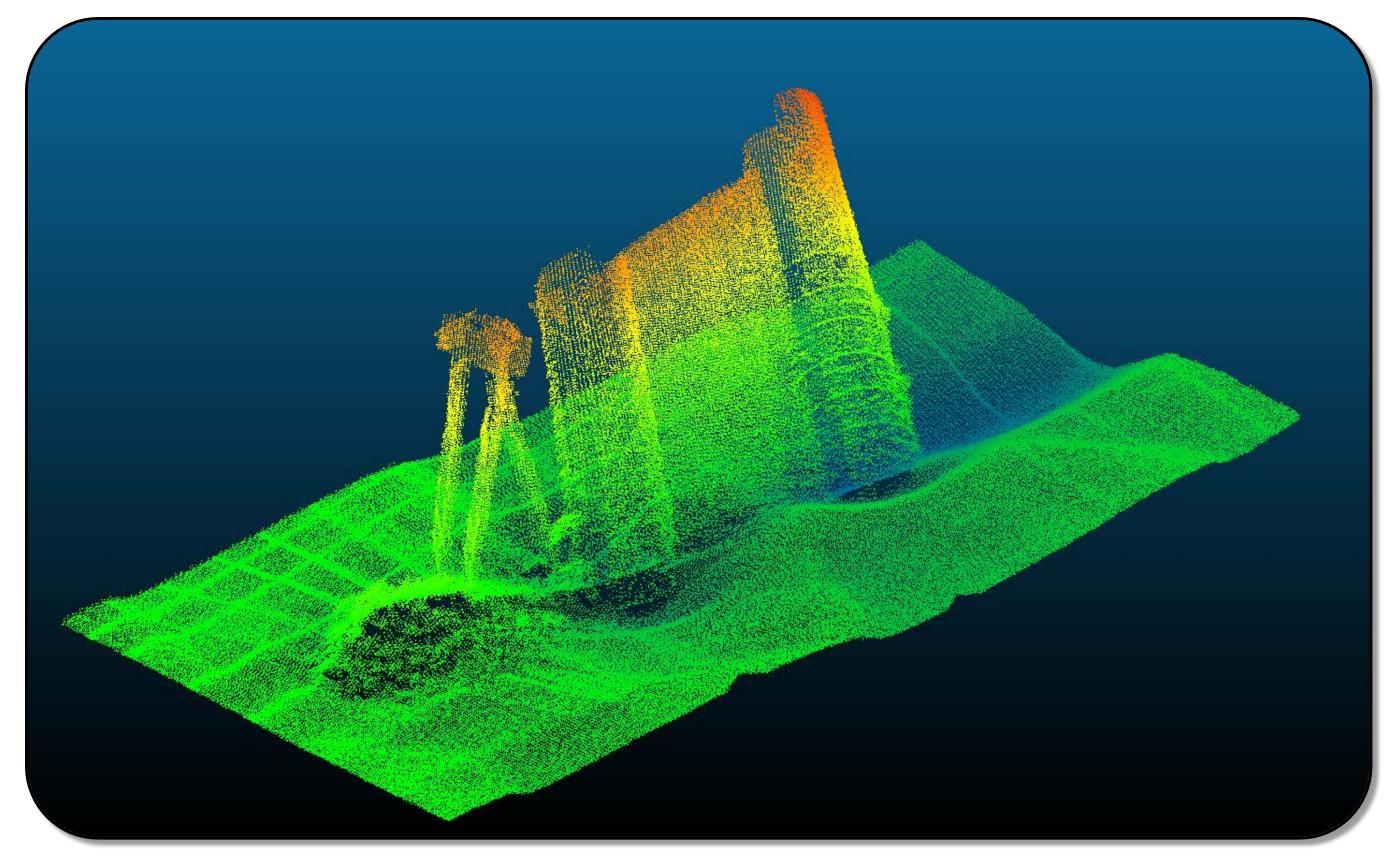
Perspective view of Pier 10 point cloud (looking from the northeast direction).
